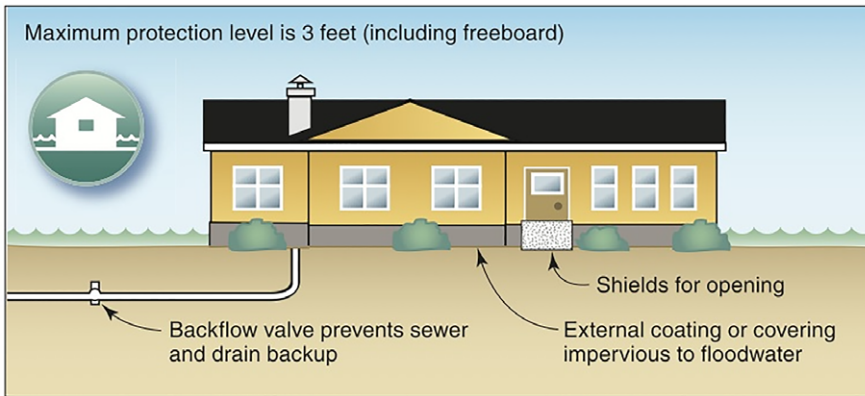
Example of a dry flood-proofed building (Source: FEMA, 2009b).
